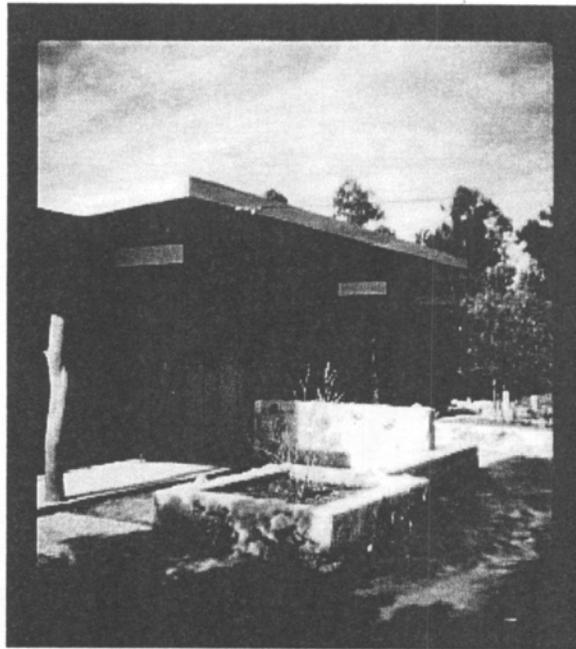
Workshop 1, exterior, view southeast of north (right) and west (left) elevations (SAMFAC, 1960)
